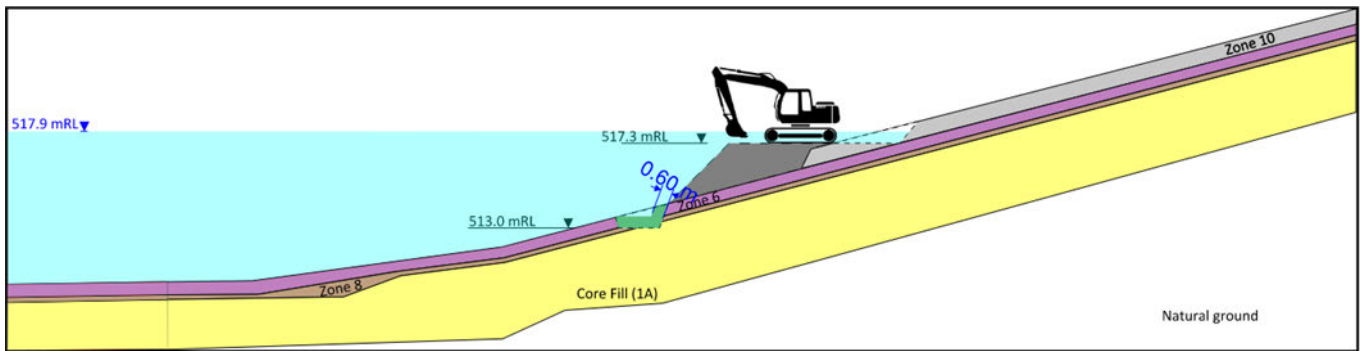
Schematic sketch – Tranche 1 – abutments - construction of key toe at 513.0 m RL and installation of rip-rap bedding – Not to Scale
